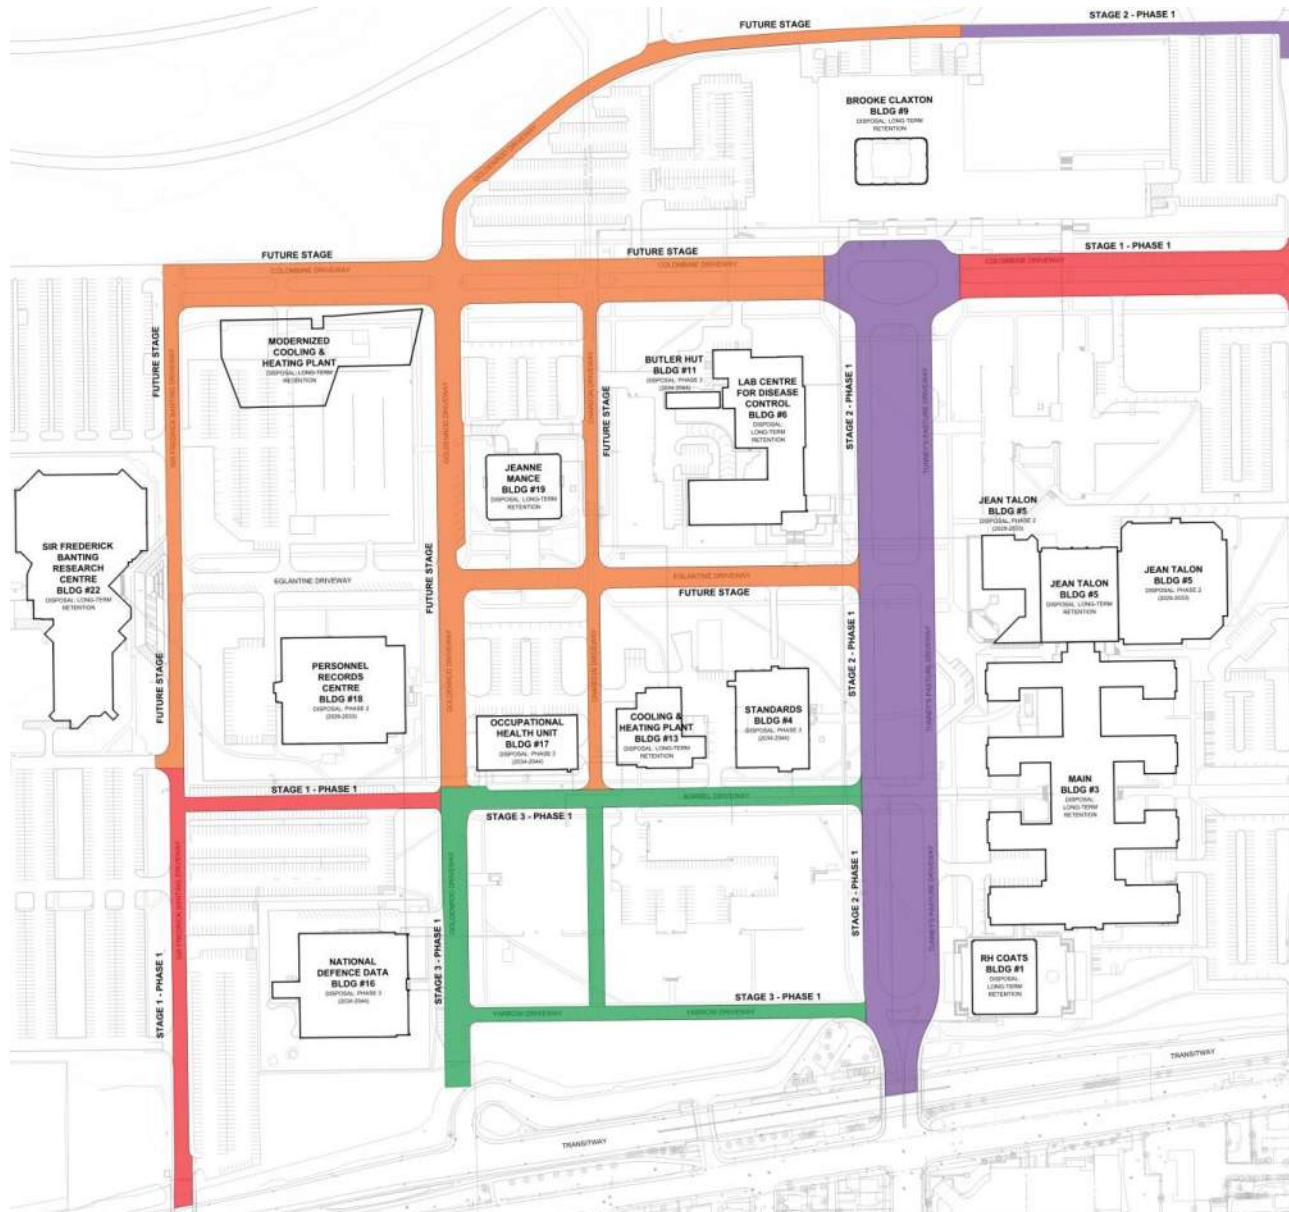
Road Infrastructure Redevelopment Plan via Attain (Attain Drawing Page #3)
